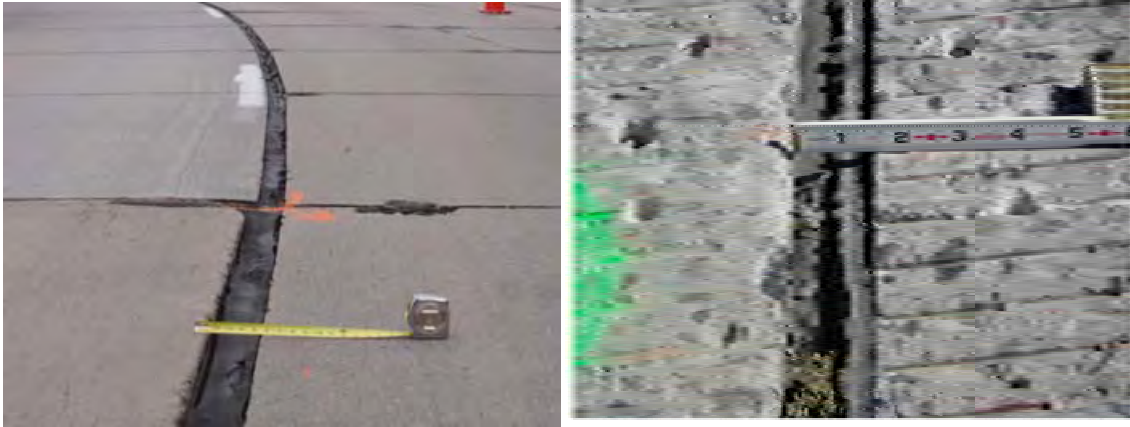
Examples of excessive longitudinal joint openings in in-service pavements.
